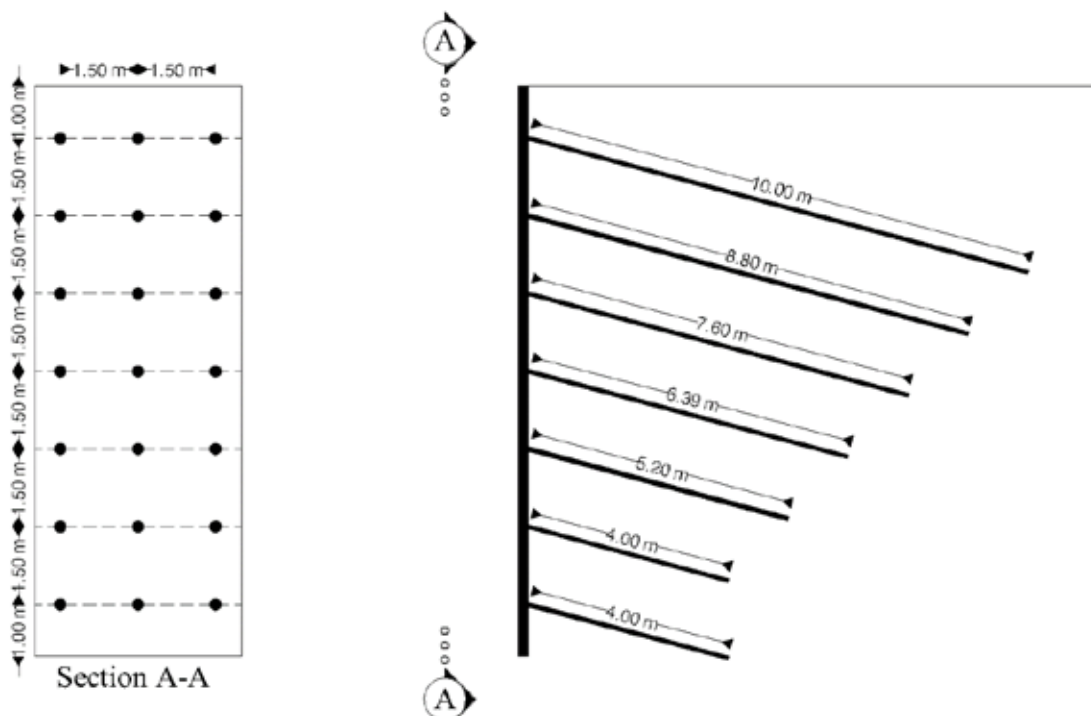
The soil nails arrangement and specifications in 11 m height wall.
